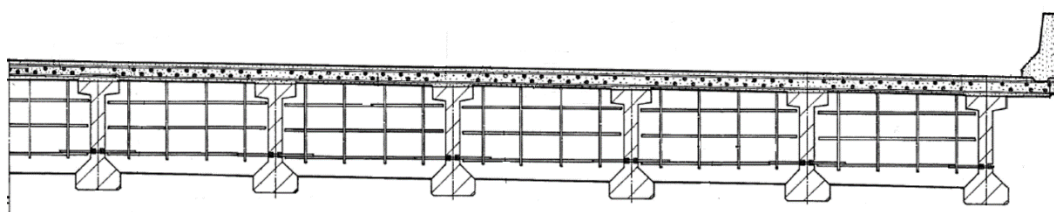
Longitudinal reinforcement steel arrangement in the deck
